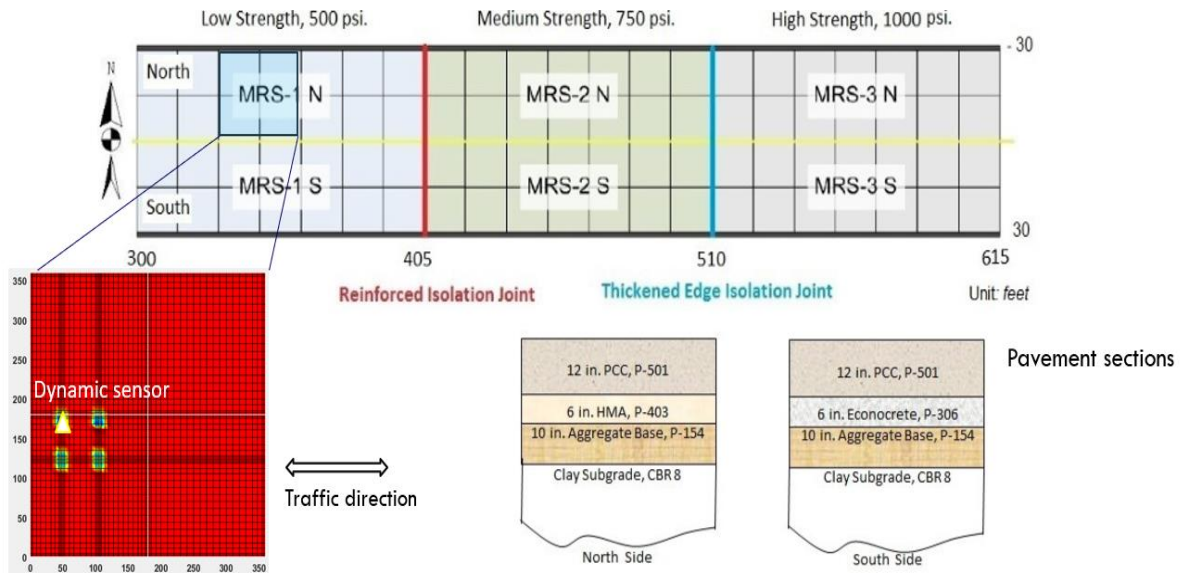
Layout of CC-6 Test Items at NAPTF Pavement Plan Showing Three Test Items and Transverse Cross-Section Showing Pavement Structure (McQueen and Hayhoe 2014)
